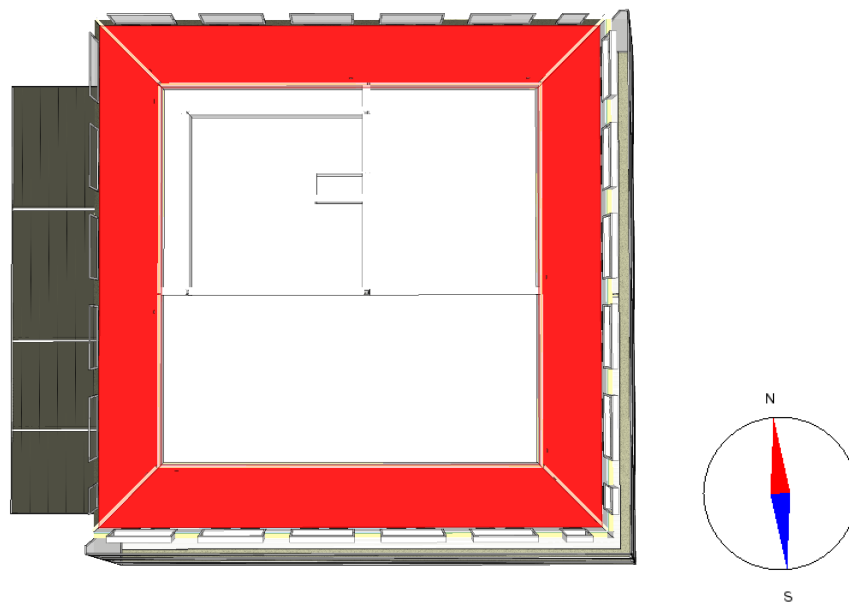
Perimeter zones on an arbitrary floor in the building marked in red.
